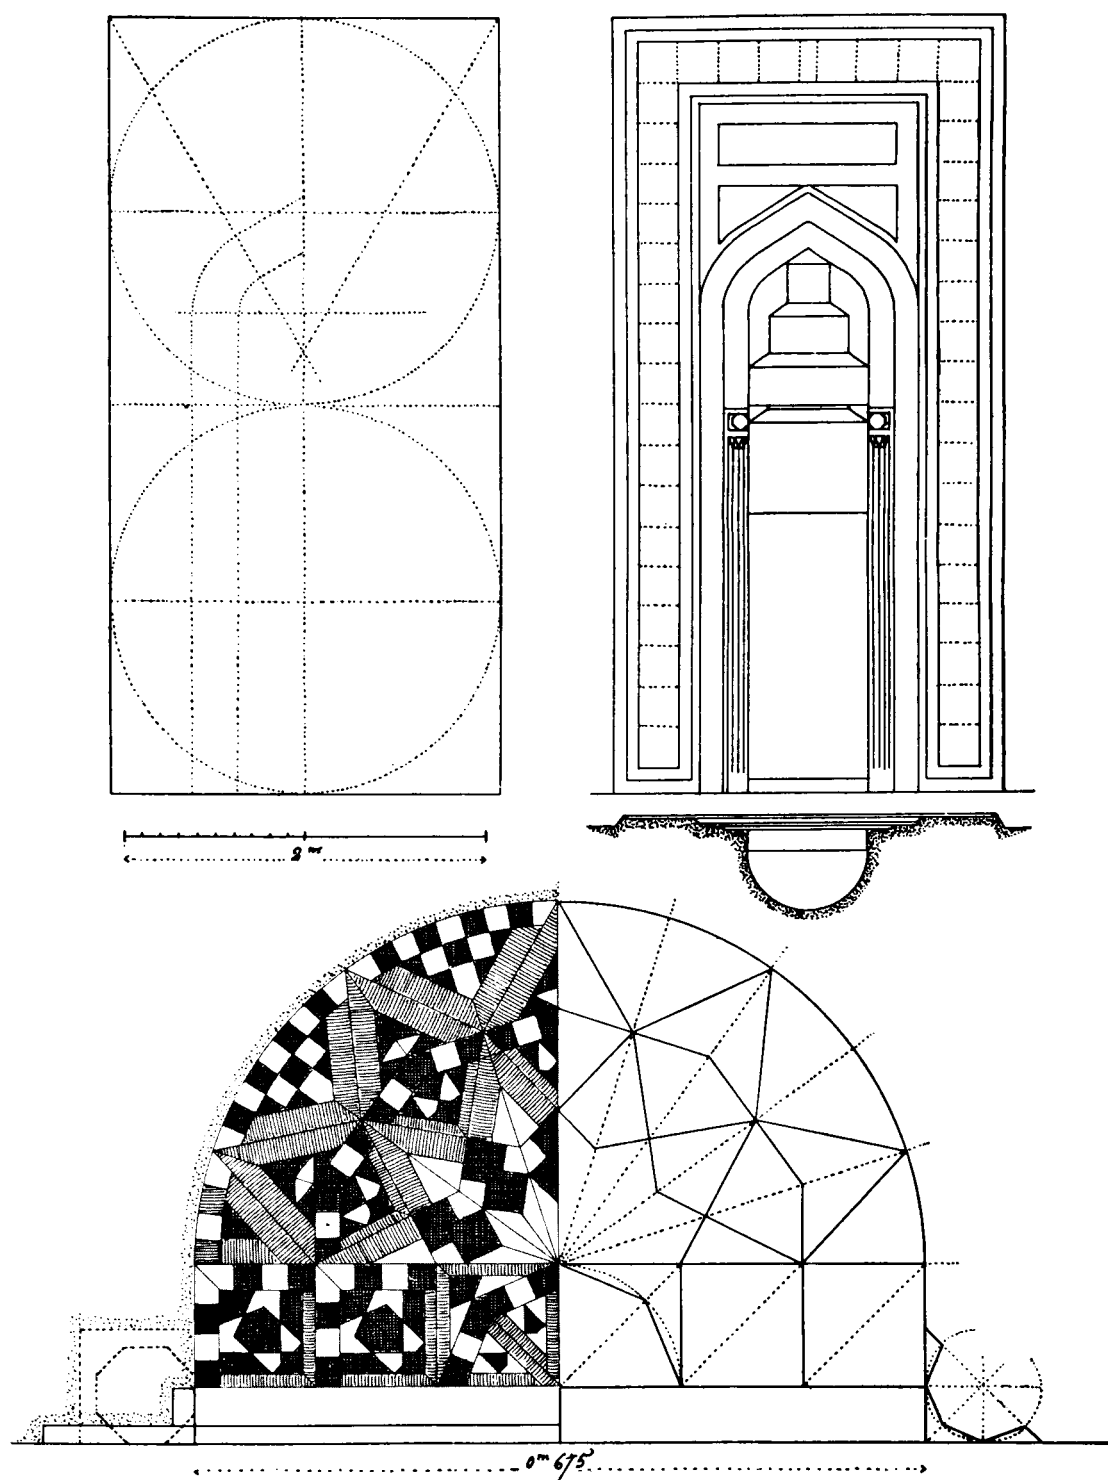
Madrasa of al-'Ayni : plan and elevation of *mihrāb* (after Bourgeois).
